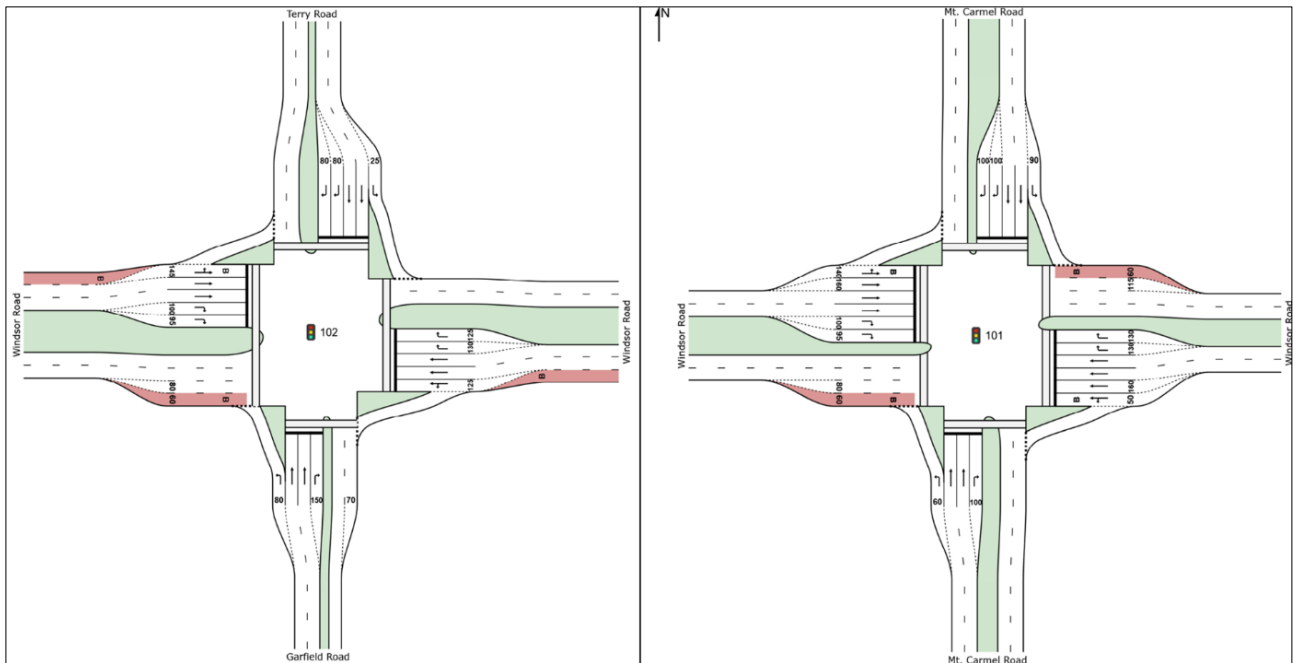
Windsor Road/ Terry Road Intersection (left) & Windsor Road/ Mount Carmel Drive Intersection (right)
